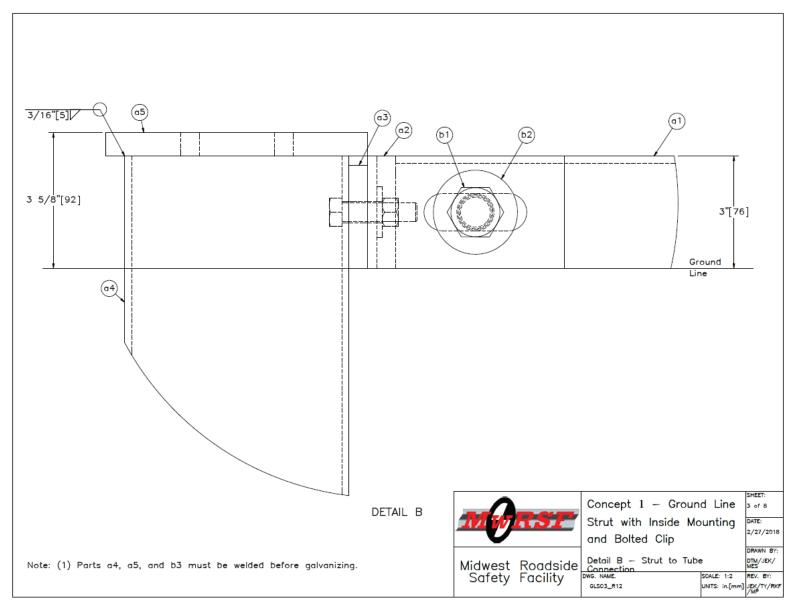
Ground Line Strut Design Concept No. 1 – Strut to Tube Connection
